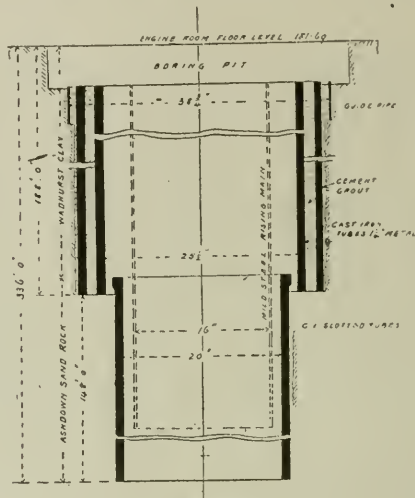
Section of Bore Wells, Showing Method of Lining, Etc.
